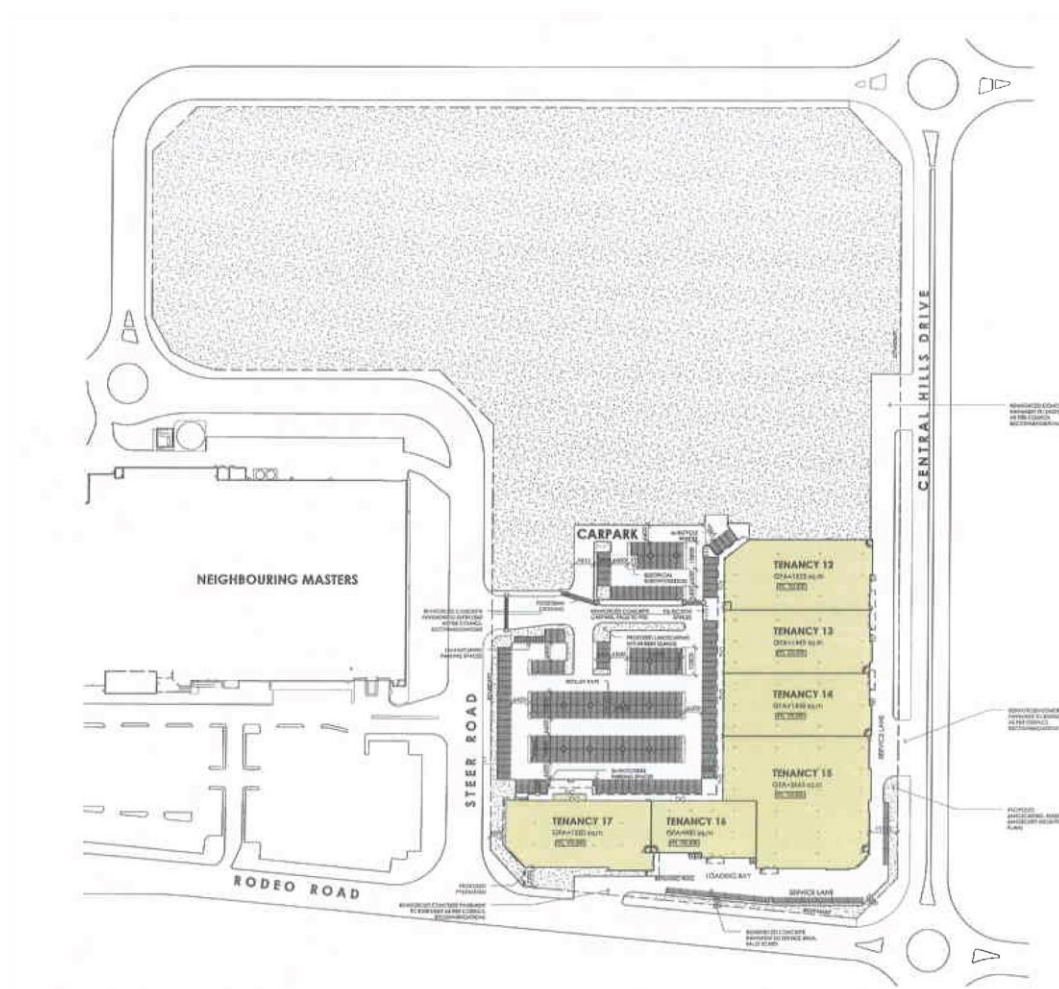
DA 752/2012 - Building A Stage 1 DWG DA09 By Leffler Simes Architects.
